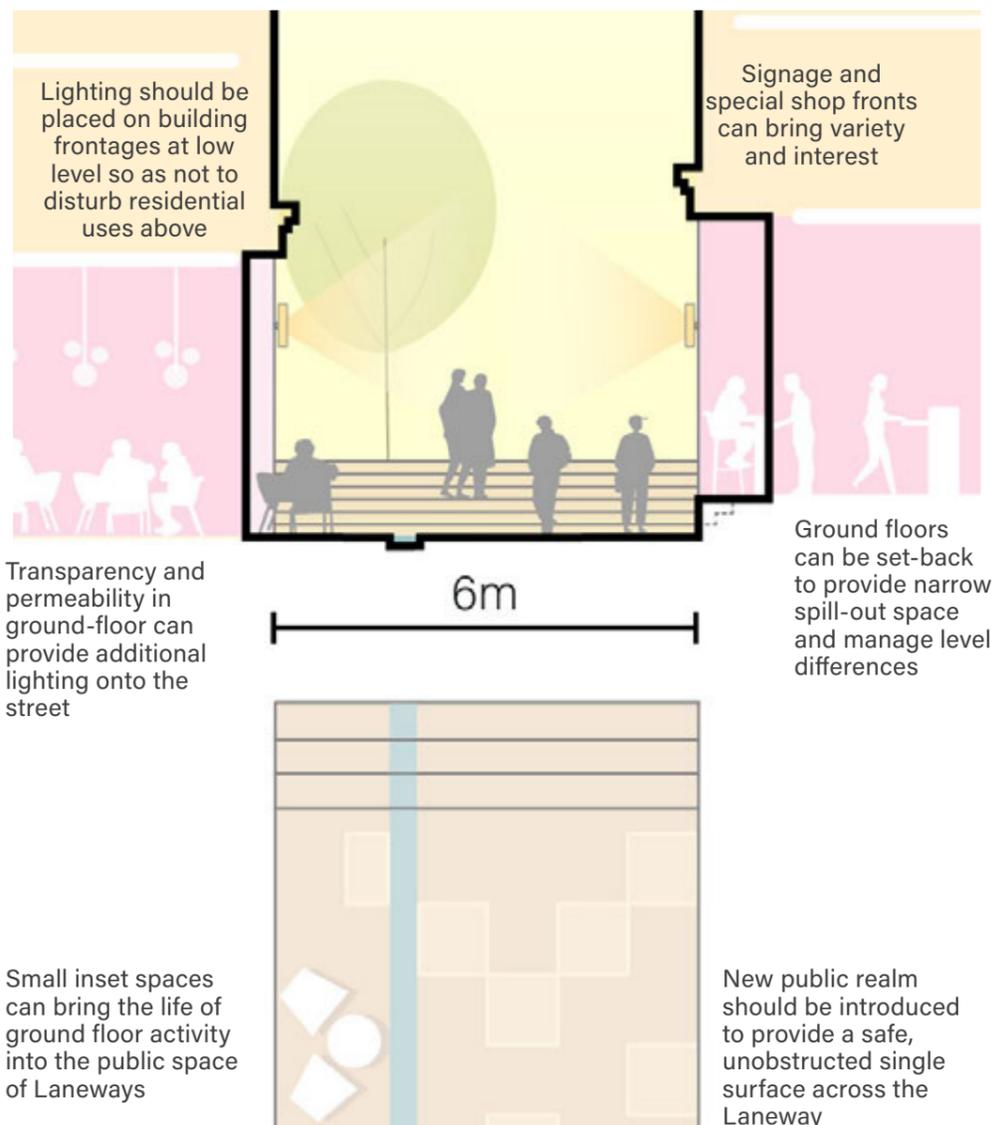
Section Enlargement - Open Laneway (at a Green Stream)
